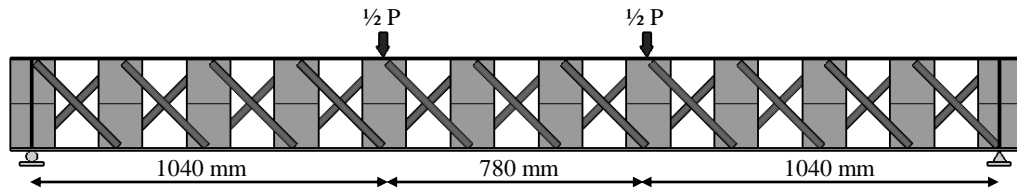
The Specimen of full height rectangular opening castellated steel beam with diagonal stiffener
